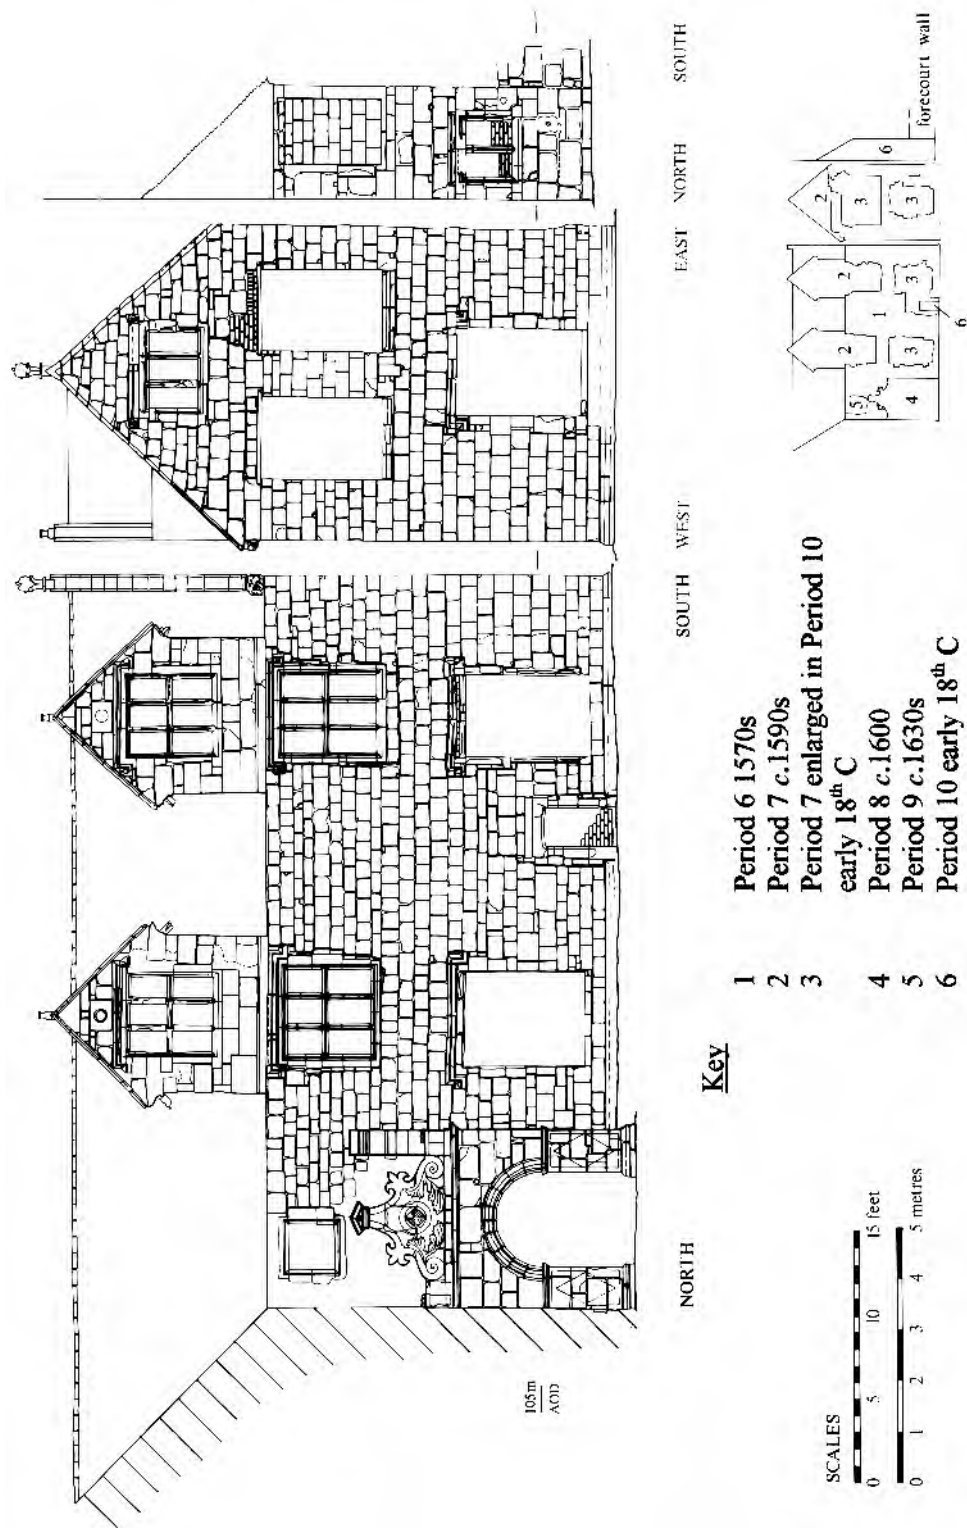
Forecourt elevations of east wing and porch door (1:150)
